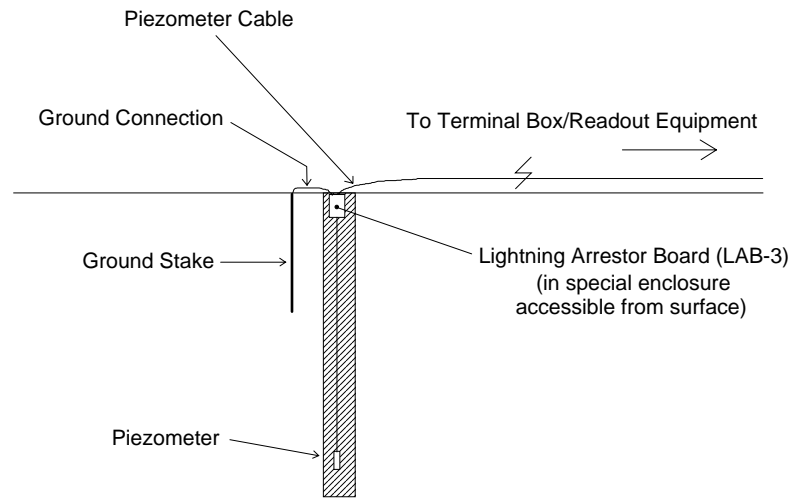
Recommended Lab-3 Lightning Protection Scheme
